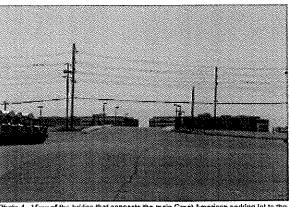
View of the bridge that connects the main Great American parking lot to the stadium site, looking wast from Centennial Boulevard.
